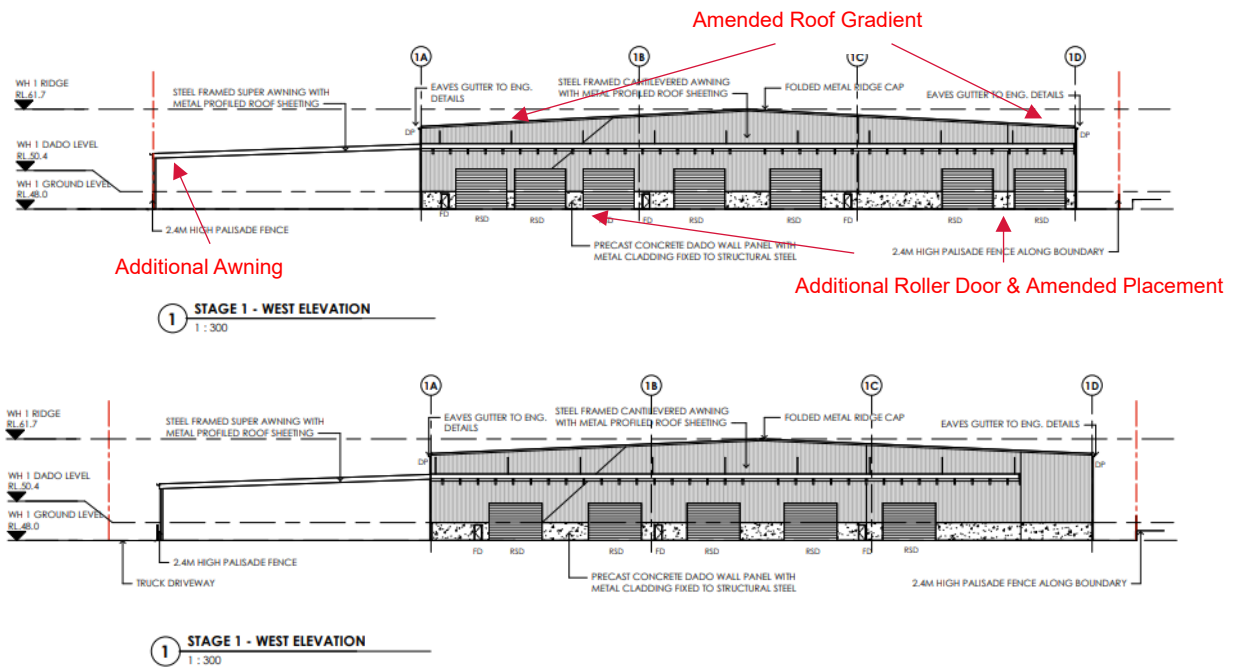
| Proposed western elevation (top figure) compared to approved western elevation (lower figure) via Airs Rd.
